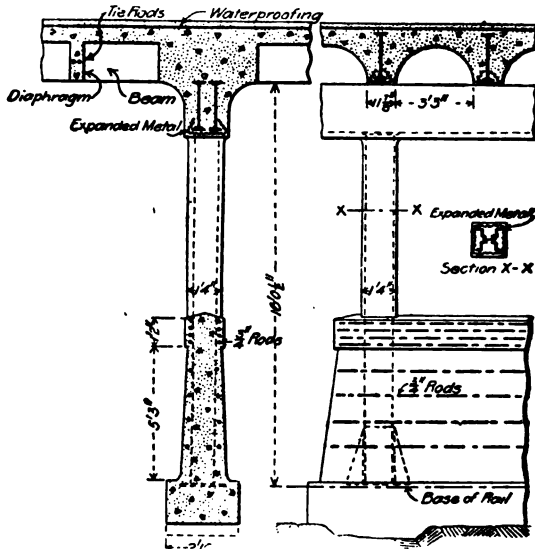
Part Longitudinal Section of Ossining Tunnel.
